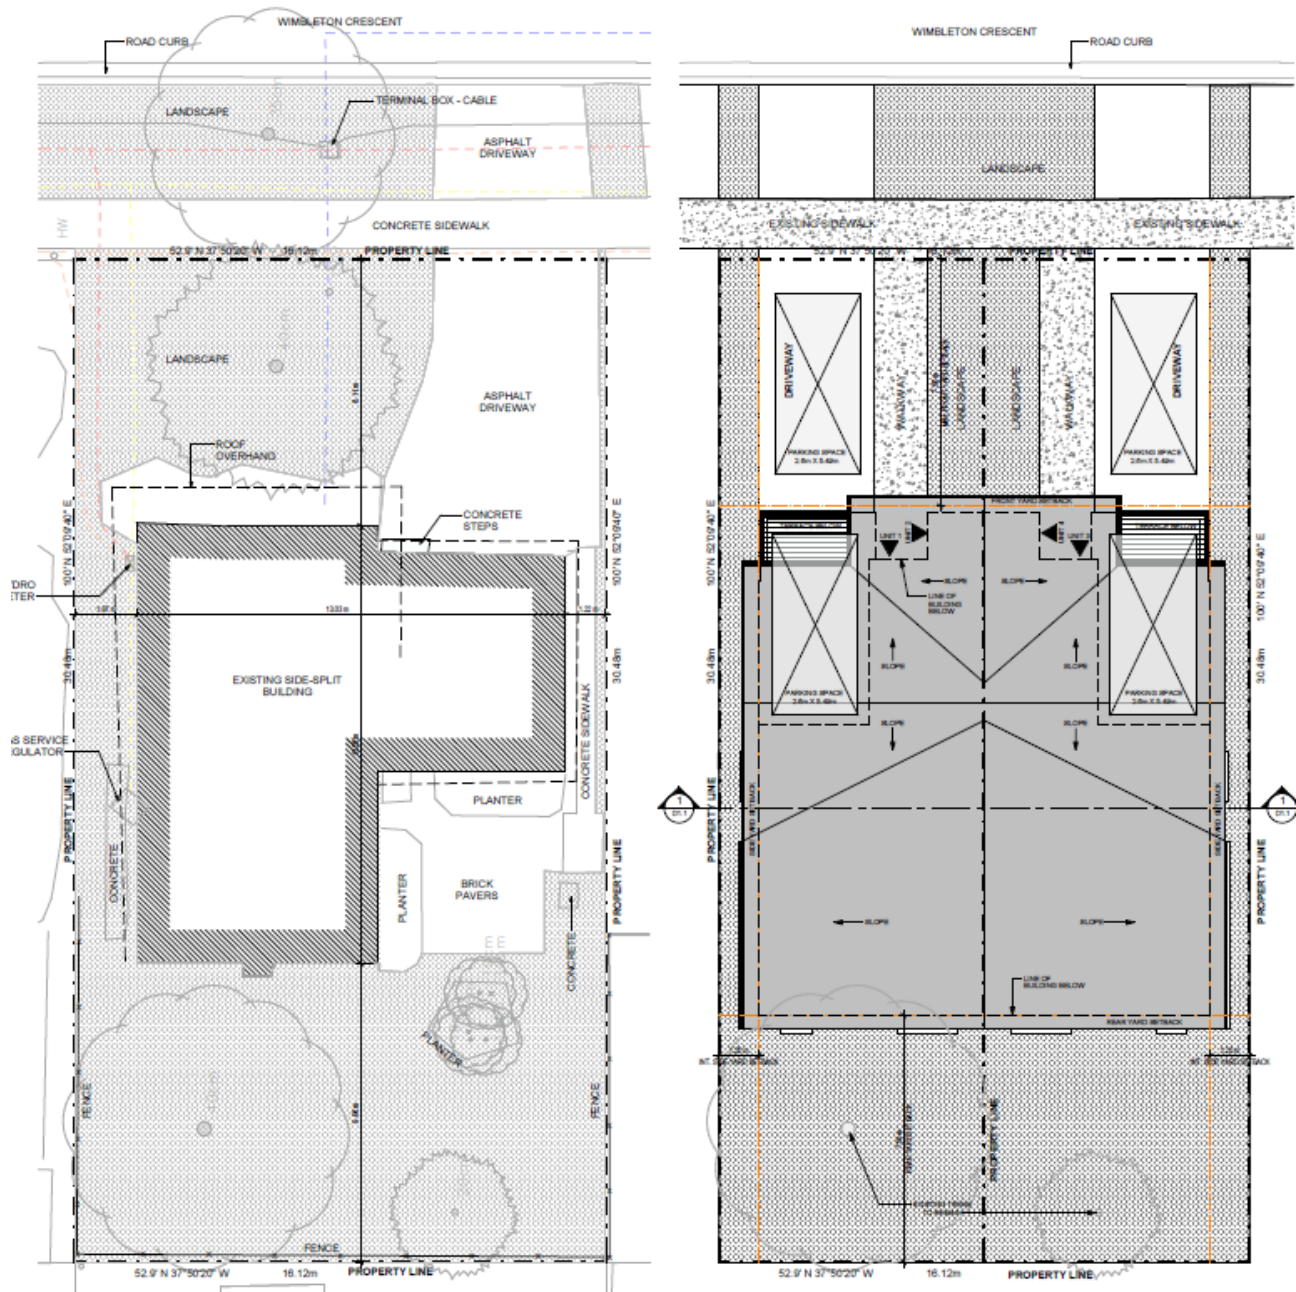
Existing Conditions (Left) And Site Plan (Right)
